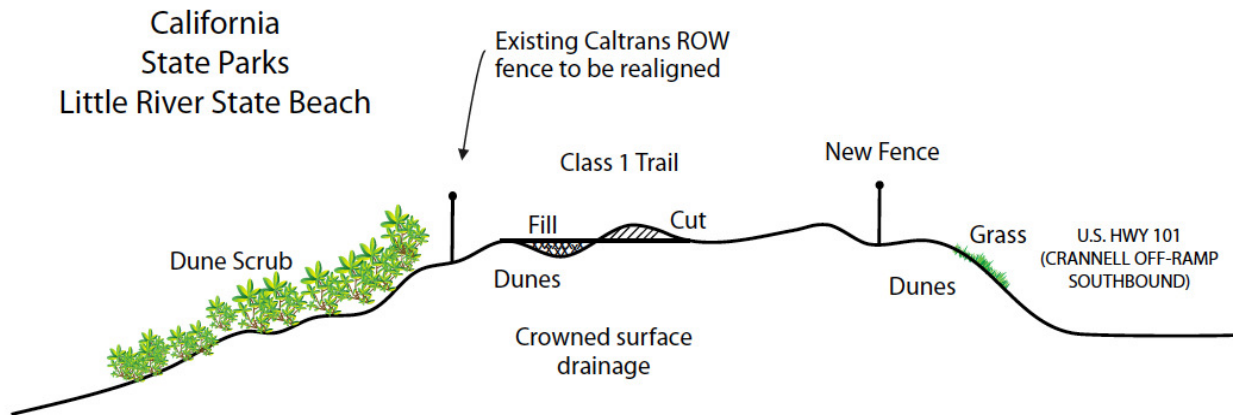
Section S2 from Little River Bridge to Crannell Road
